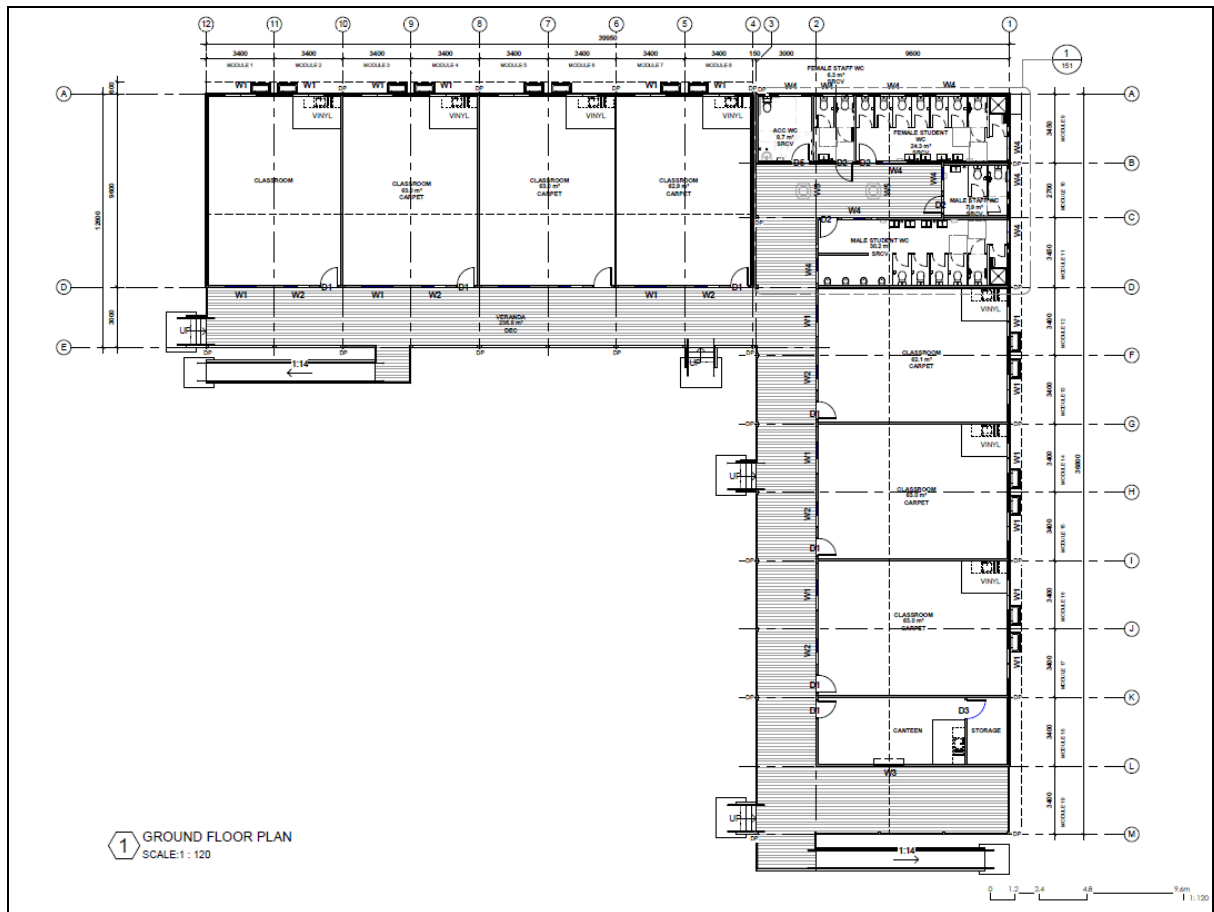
Extract of Floor Plan of proposed Temporary Demountable Buildings
